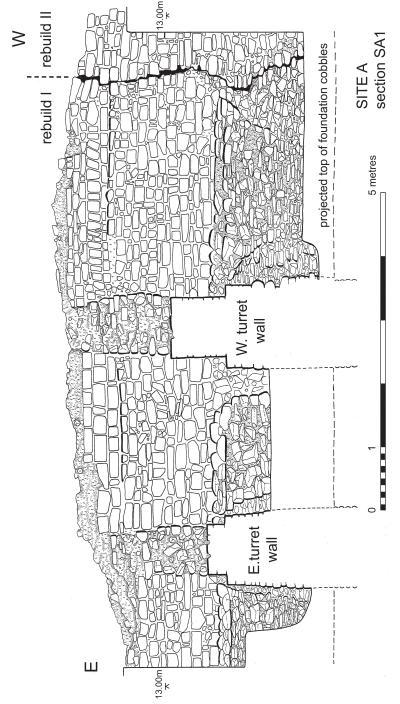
Elevation of the rampart wall at the corner turret showing the junctions between rebuilds. Note the change to carefully coursed masonry towards the top of the wall on either side of the west turret wall.
